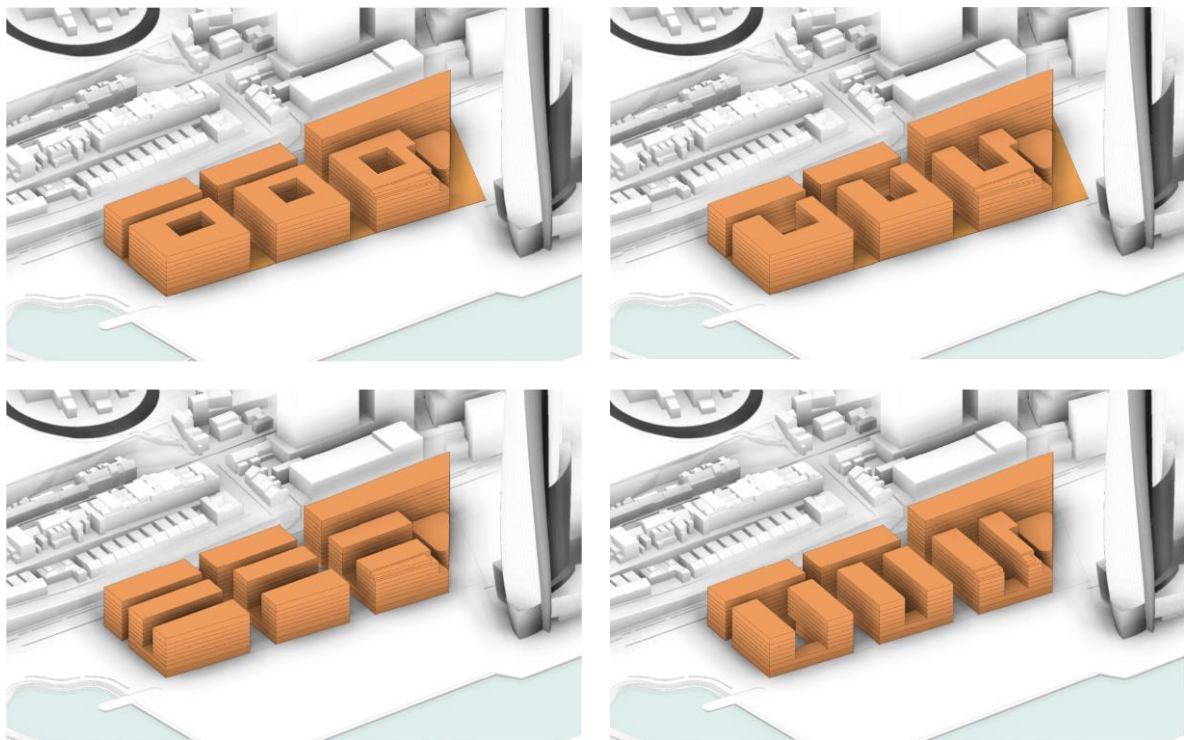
Indicative examples of built form configurations within the proposed building envelopes. (Source: SJB 2023)
